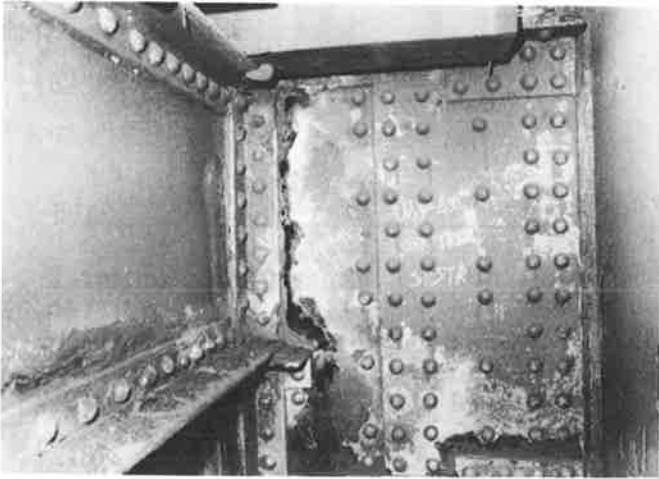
Corroded Web Penetration Along Vertical Angle Legs of Stringer End Connection to Floor Beam
